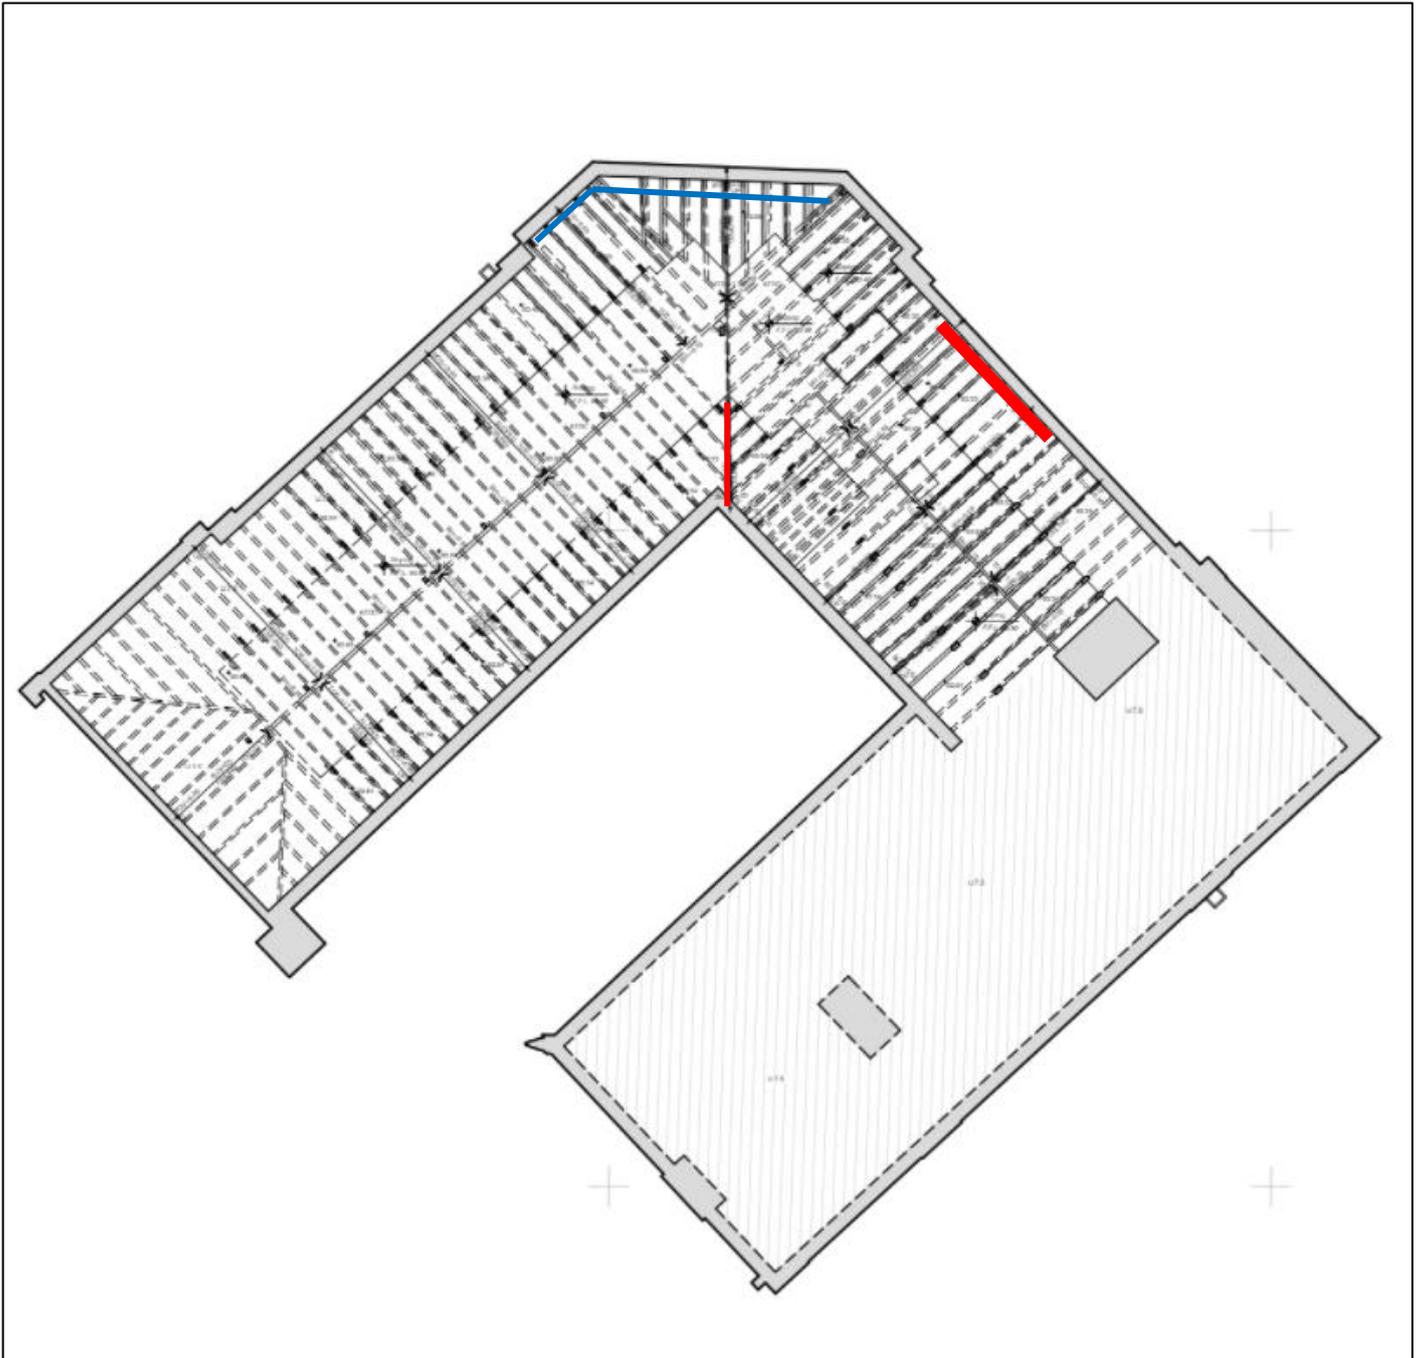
Showing the roof plan. Areas marked in red show where we exposed the decayed wallplate at the underside and decayed valley rafter. The area marked in blue shows the previously repaired wallplate.
